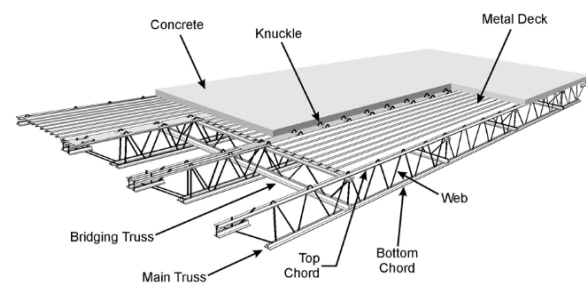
Floor system used in the Twin Towers (McAllister, 2013).
